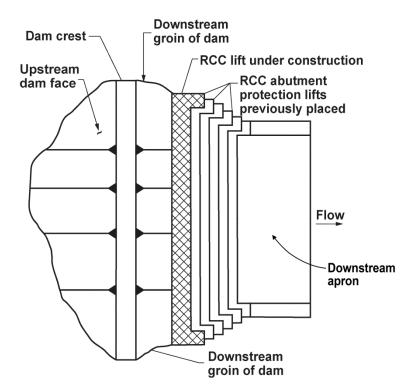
Plan of RCC overtopping and abutment protection partially constructed (PCA, 2002, all rights reserved).
